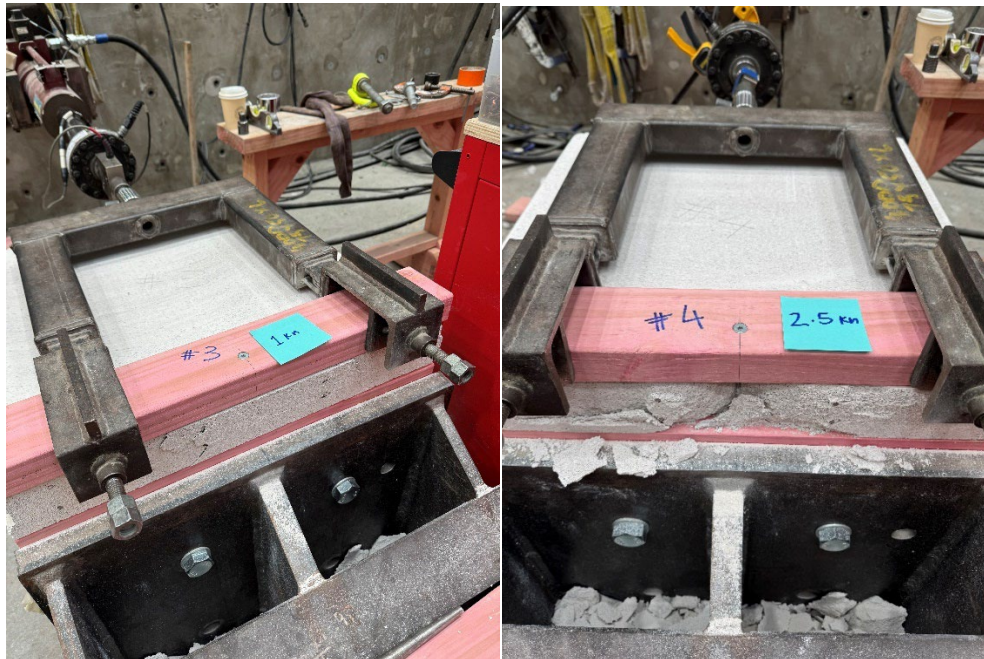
Out of plane testing initial cracking and spawling of concrete floor panel during early cycles of testing
